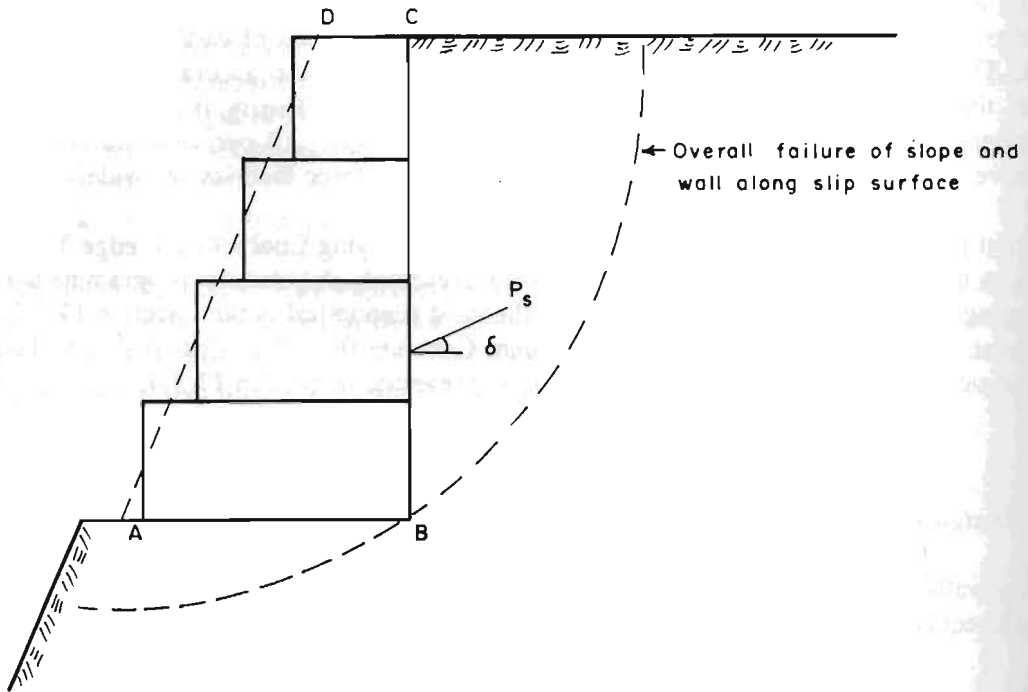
Assumed trapezoidal section of gabion wall (ABCD)
